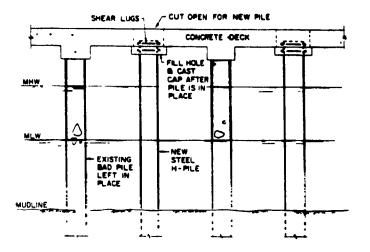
ADDITION OF NEW PILE TO EXISTING STRUCTURE®
